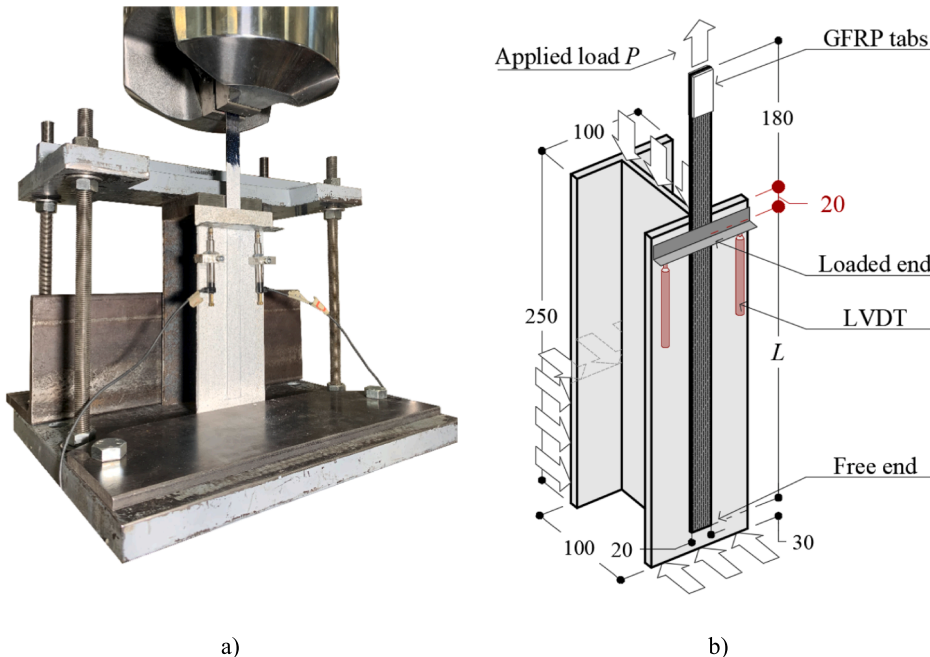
Single-lap direct shear test set-up: a) photo and b) specimen geometry (dimensions in mm).
